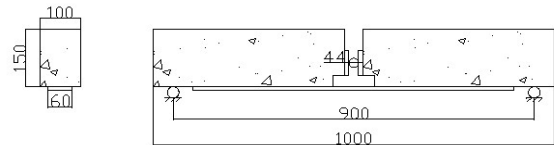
Shape and Dimensions of Test Specimen(mm)
